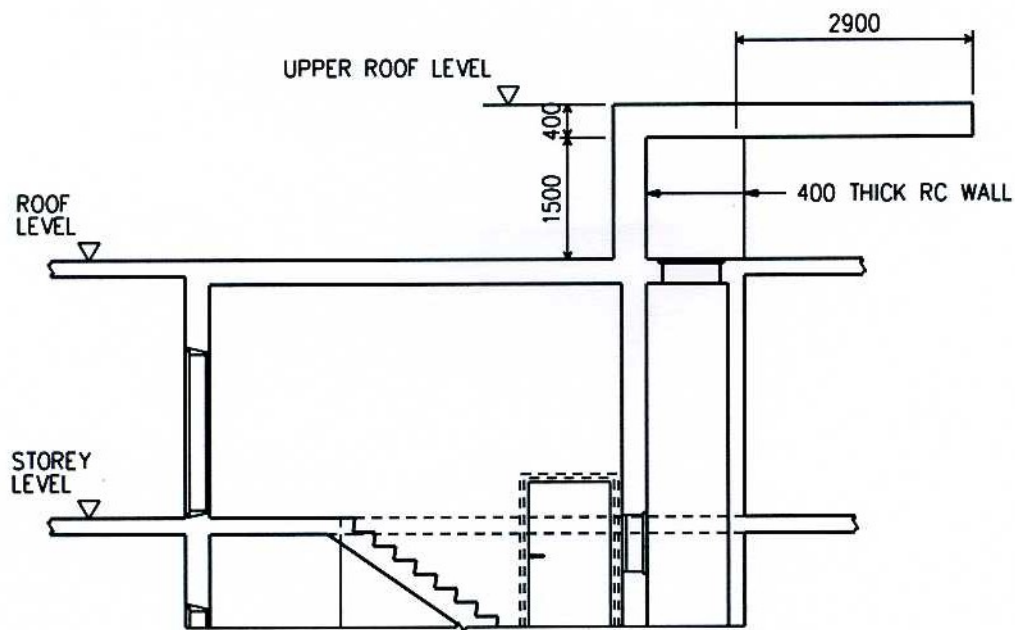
(b-5) SECTION Z - Z OF STAIRCASE STOREY SHELTER
